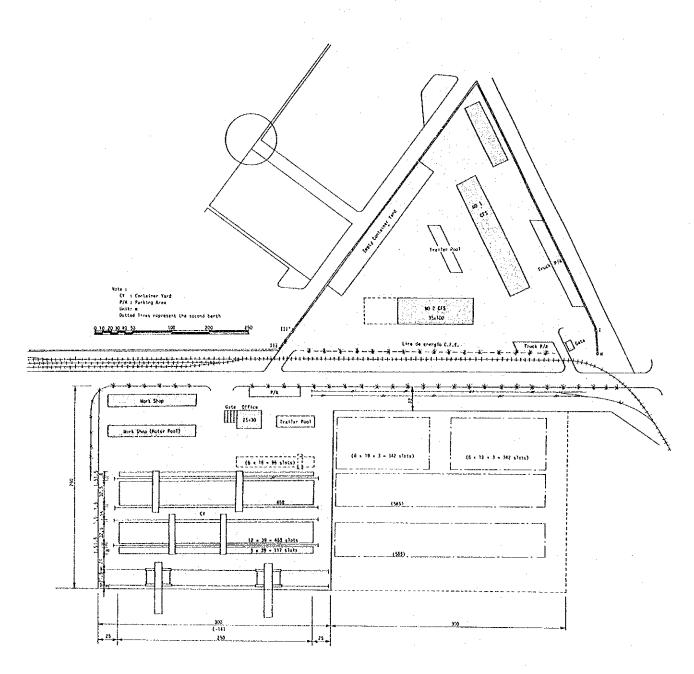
Layout Plan of New Container Terminal - Rail Mounted Transfer Crane System
